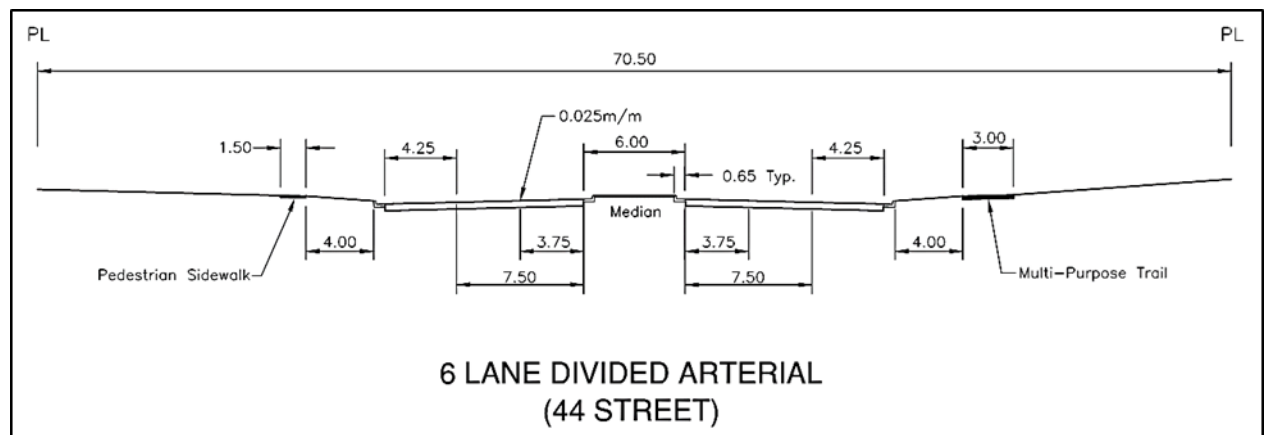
Typical Cross Section for a 6 Lane Divided Arterial (44 Street Functional Plan)
